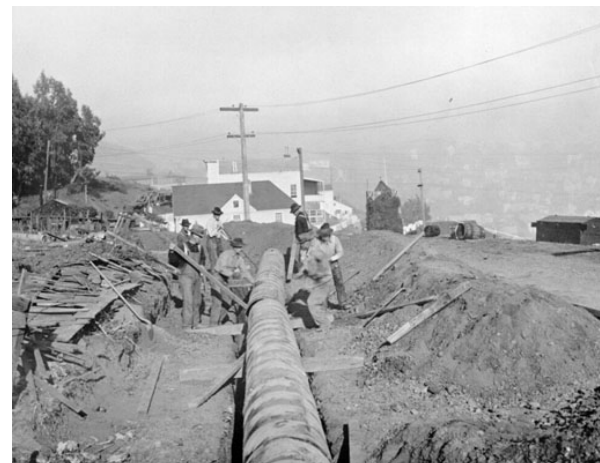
Building 24-inch sewer pipe on Corbett Road looking north toward Corbett Heights, ca. 1921. (San Francisco History Center, San Francisco Public Library. AAB-3461)
